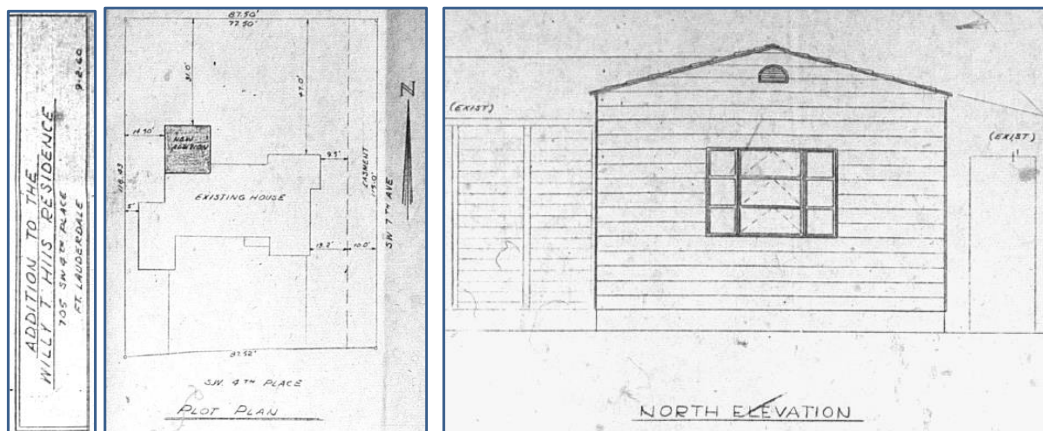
1960 Bedroom Addition Plot Plan and North Elevation
